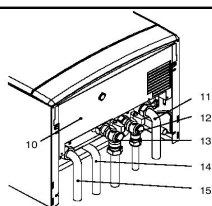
bottom view of the boiler/ widok dolnej części kotła
